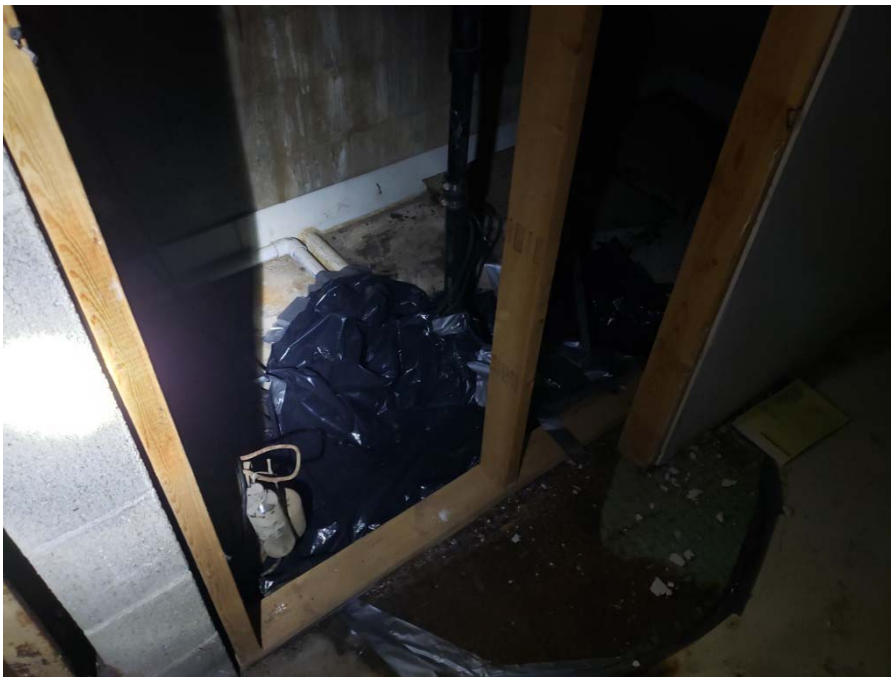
Sump at back wall of Jim's annex (4/2/20; 13:37).
